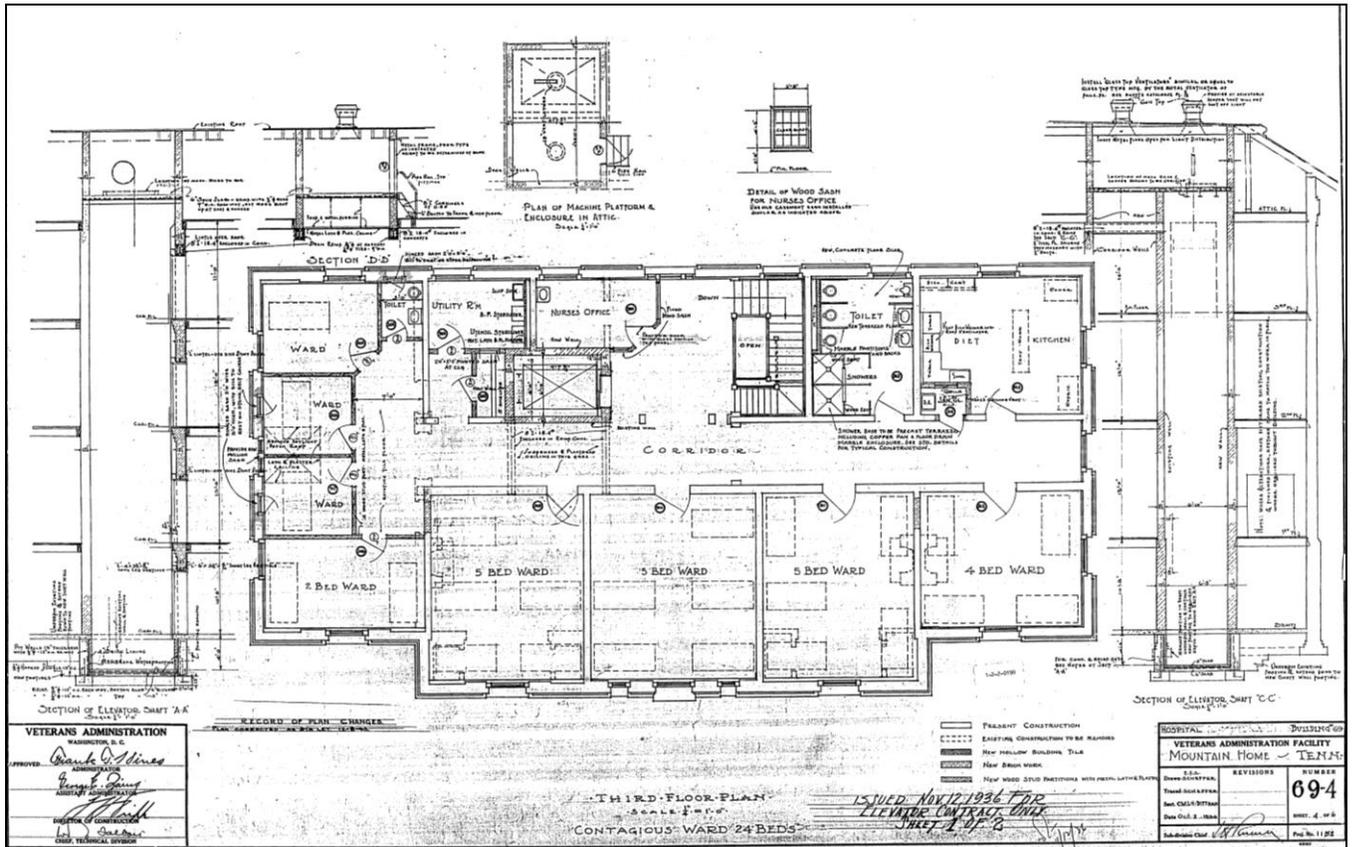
Third Floor Plan, Building No. 69, (2 October 1936)
